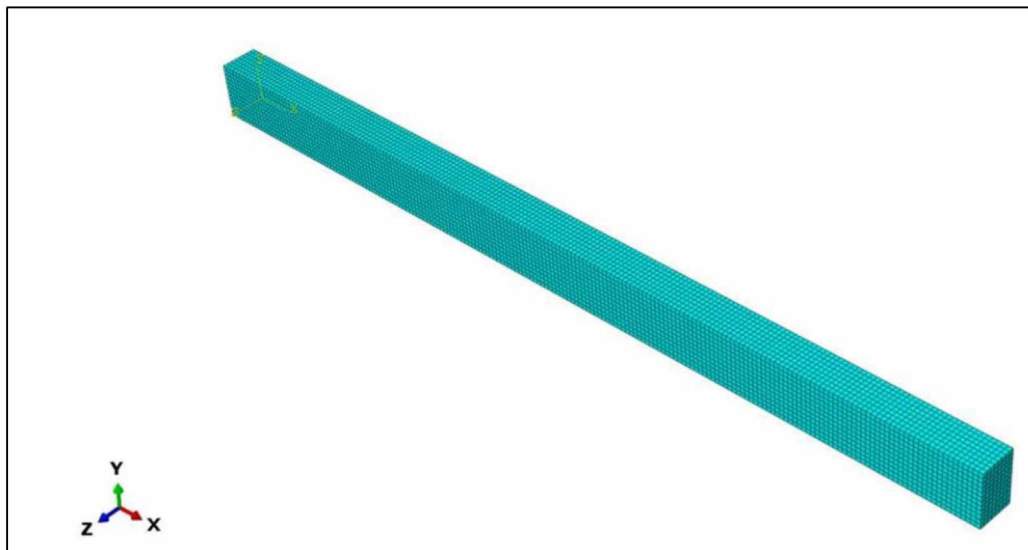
Reinforced Concrete Beam (B1RC) of 1 inch (25 mm) Mesh Size
